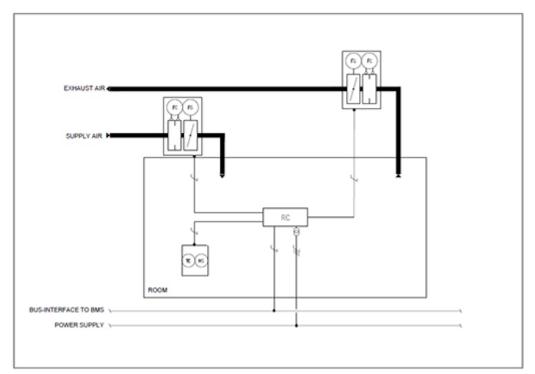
Wiring example for Halton Max MOS with a master-slave configuration In this example, the supply unit is controlling the exhaust unit.
